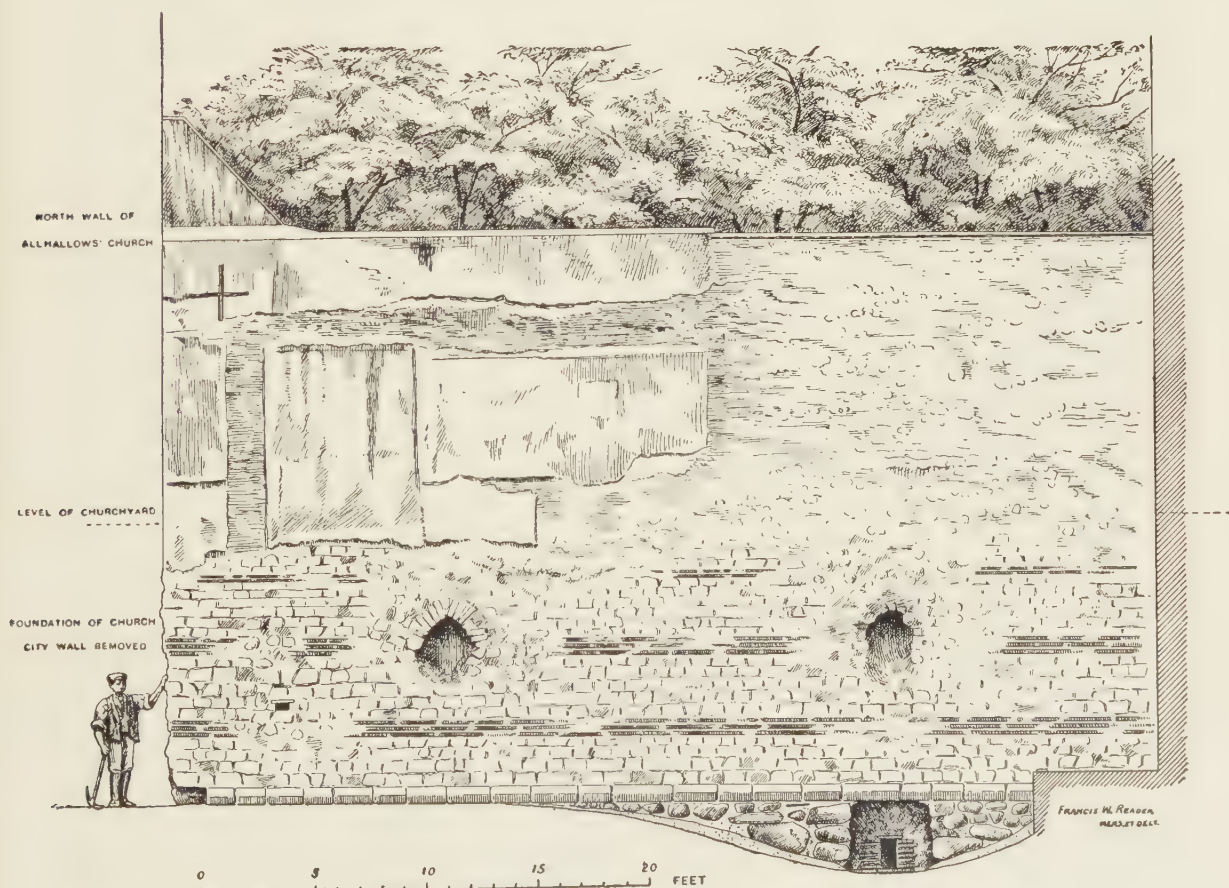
CITY WALL, WEST OF ALLHALLOWS CHURCH
